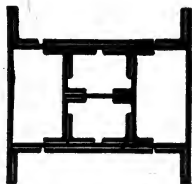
Heavy Column Section. Y. M. C. A. Building, Chicago.
